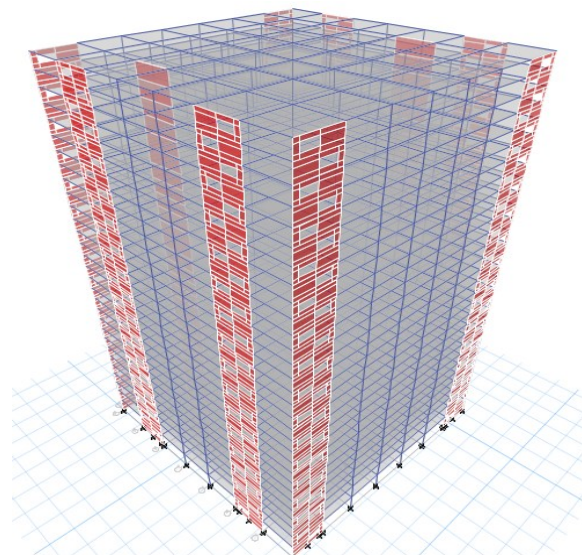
Model 3: Shear Wall with Openings (3mx1.4m): 3D view
